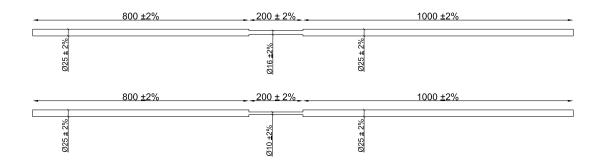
Details of the damaged (reduced rebar) steel reinforcements.
